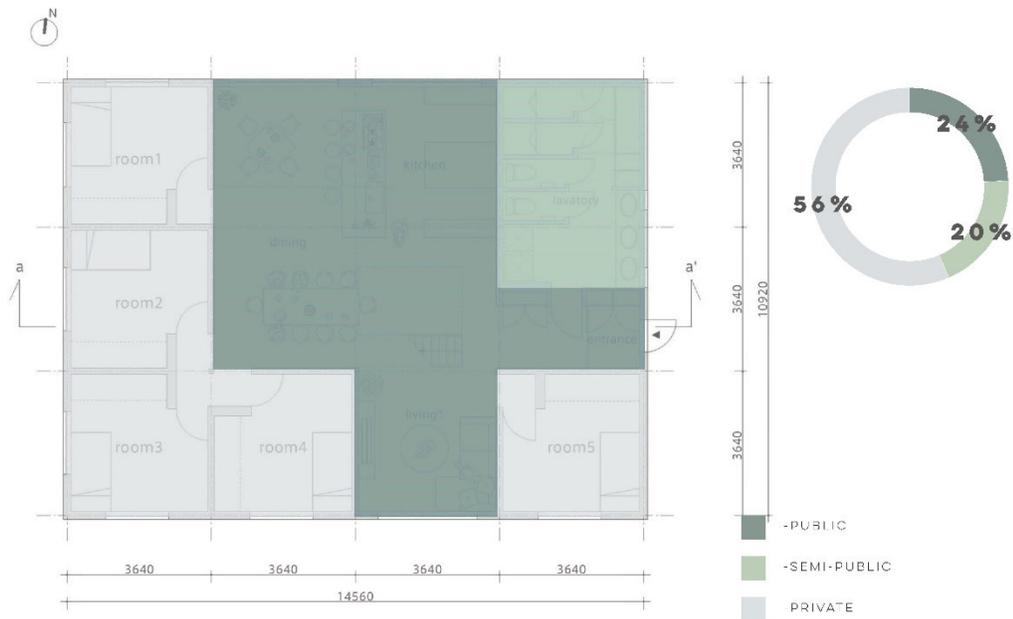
Public space diagram of LT Josai apartment (Source: Archdaily and overlay by Author, <https://www.archdaily.com/497357/lt-josai-naruse-inokuma-architects/534df2adc07a80d19300004f-lt-josai-naruse-inokuma-architects-floor-plan>)
